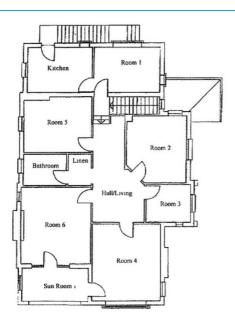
Existing first floor plan, 2007 (Source: North Sydney Council Archives, DA 56/07).
